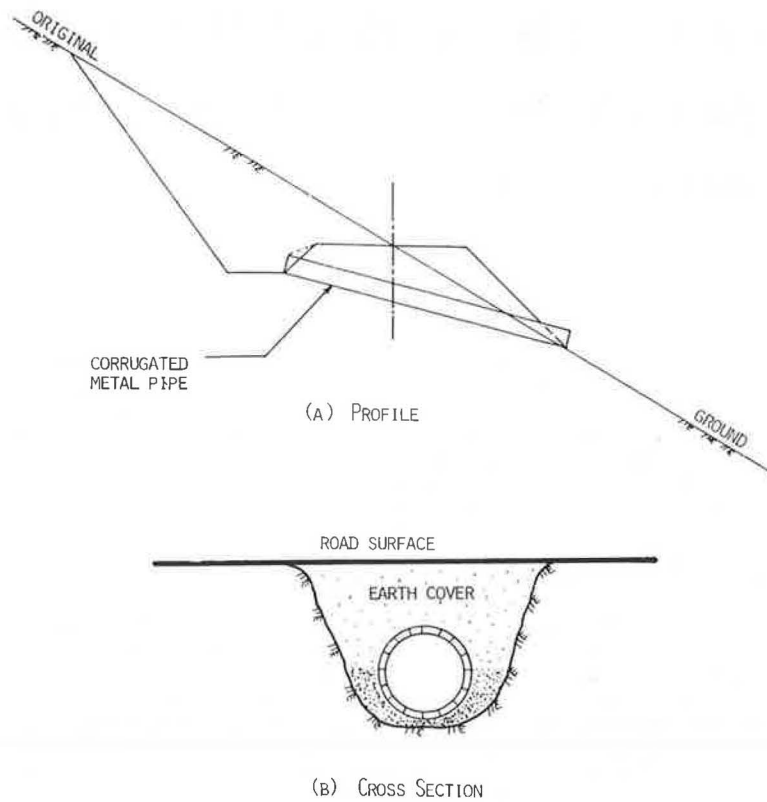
Profile and cross-section views of typical ditch relief culvert used on forest roads.
